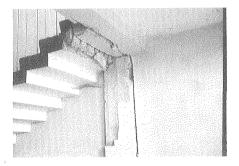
Crushing of concrete at stairs support of Little Angel's Nursery School
